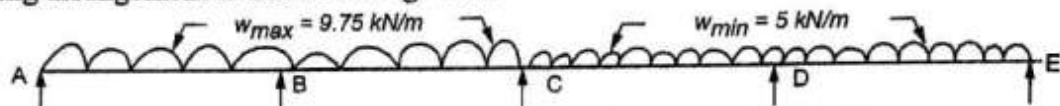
Loading Arrangement for Maximum B.M. at B
